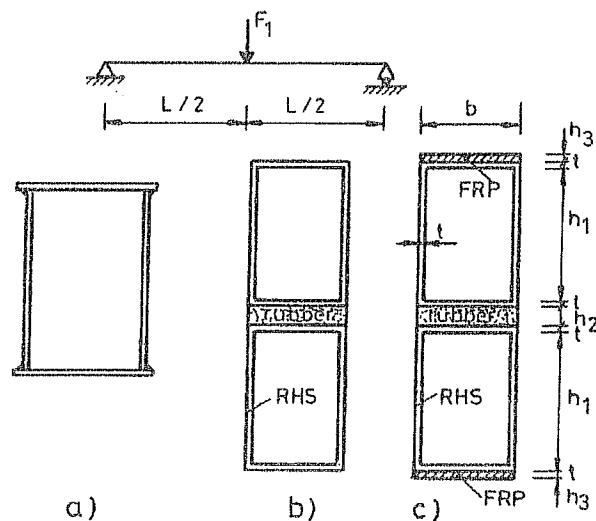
a) aluminium welded box beam, b) a three-layer beam, c) a five-layer beam
